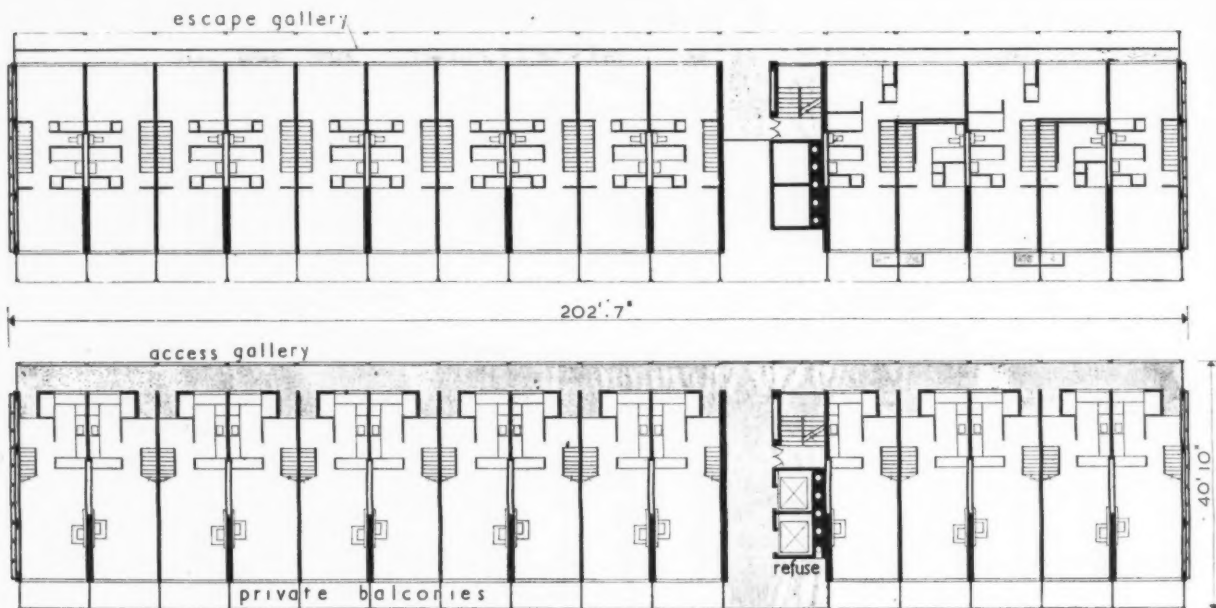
Typical plans of 11-storey block. Above, plan of bedroom floor; below, plan of ground floor.
